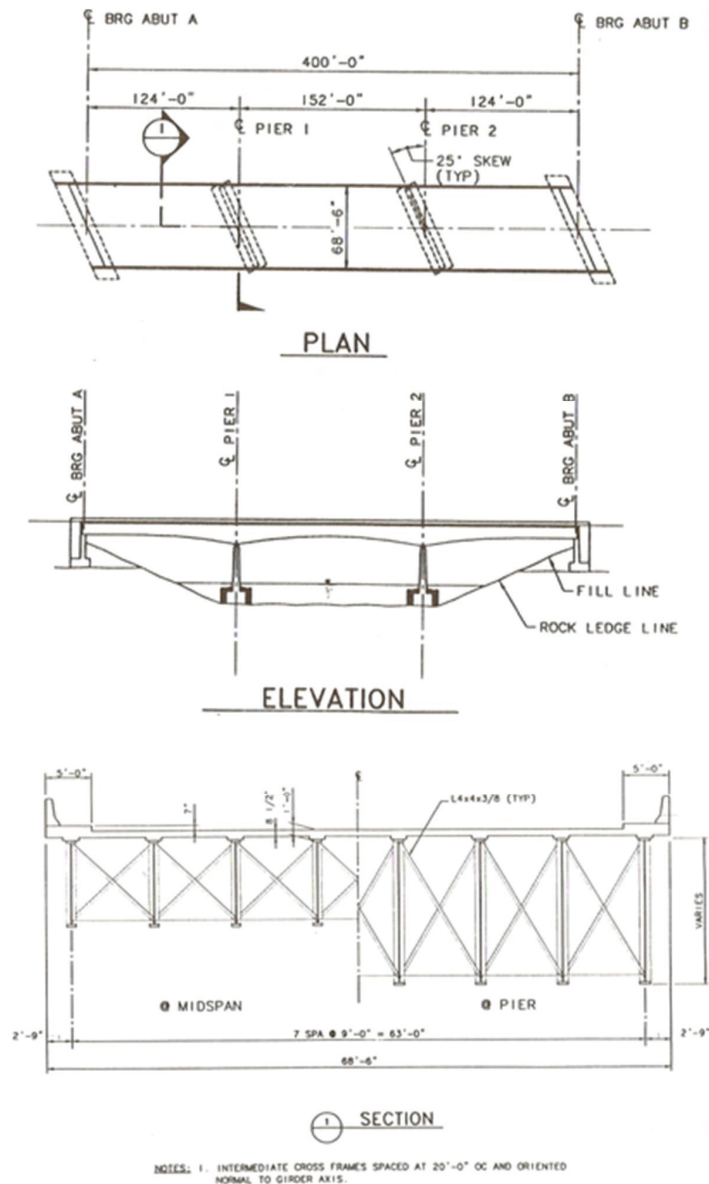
Bridge Plan, Elevation and Section (FHWA, 1997)
